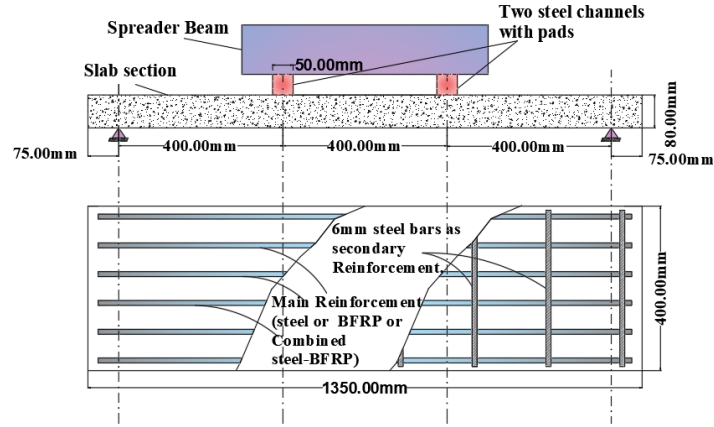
Dimensions, details of main and secondary reinforcement and test setup
